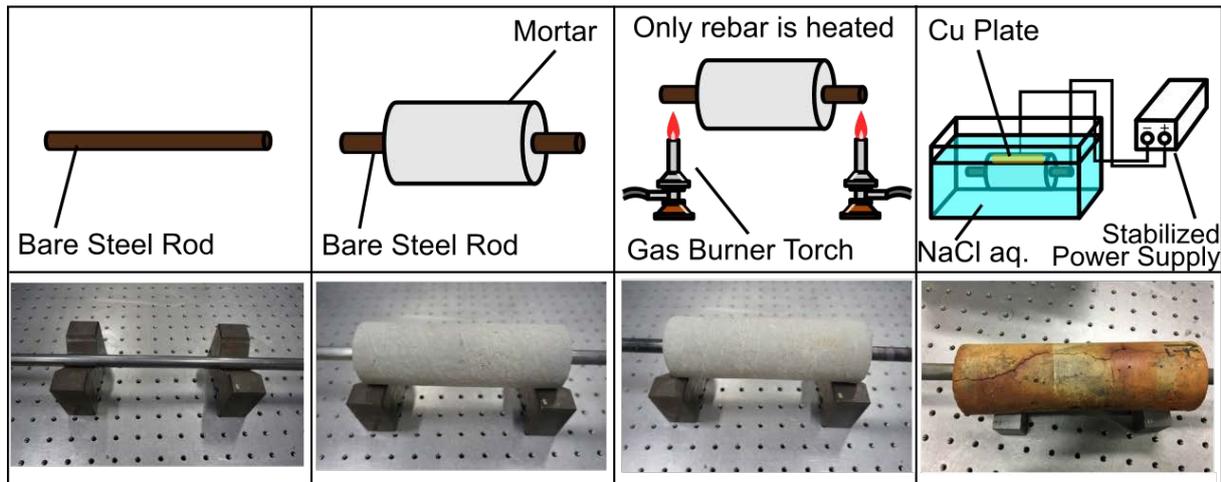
Schematic illustrations of each test piece and the actual photos: (a) bare steel rod, (b) sound reinforced concrete, (c) heated reinforced concrete and (d) electrically corroded reinforced concrete, respectively.
